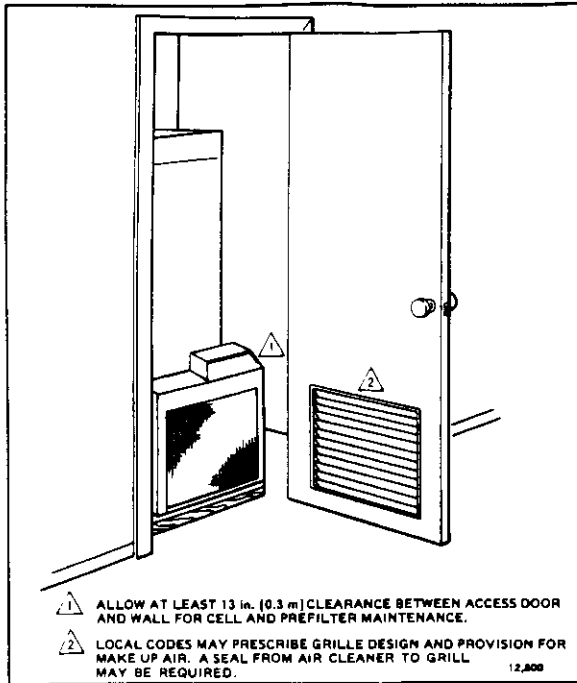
HIGHBOY FURNACE. CLOSET INSTALLATION. AIR CLEANER IS MOUNTED VERTICALLY ON FURNACE BETWEEN FURNACE AND LOUVERED RETURN AIR OPENING IN CLOSET DOOR.
